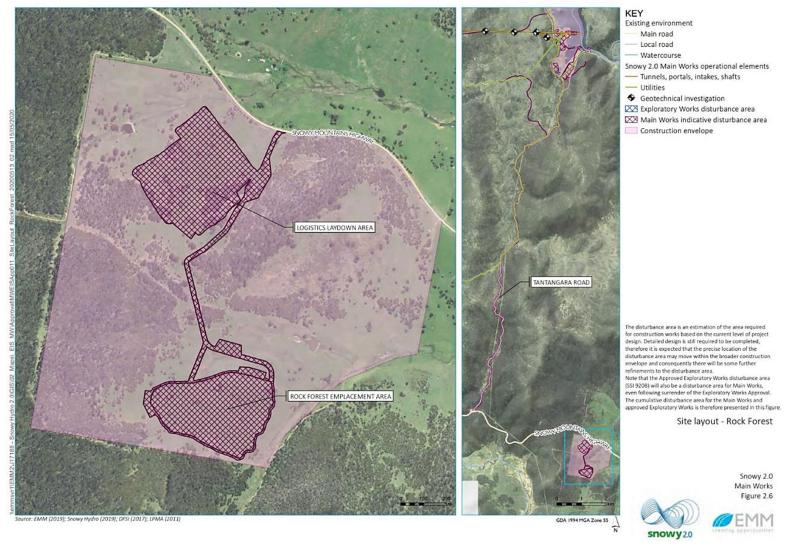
Construction areas – Rock Forest (Infrastructure Approval Appendix 2)
